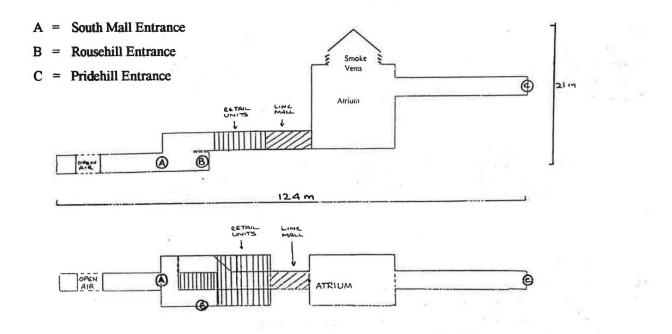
Section and plan of the Shrewsbury shopping centres (not to scale)
